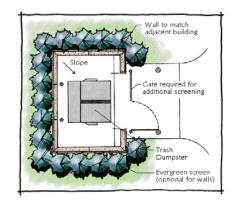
X - Enclose Dumpsters with Walls, Fences, or Plantings and Place on Concrete Pad
